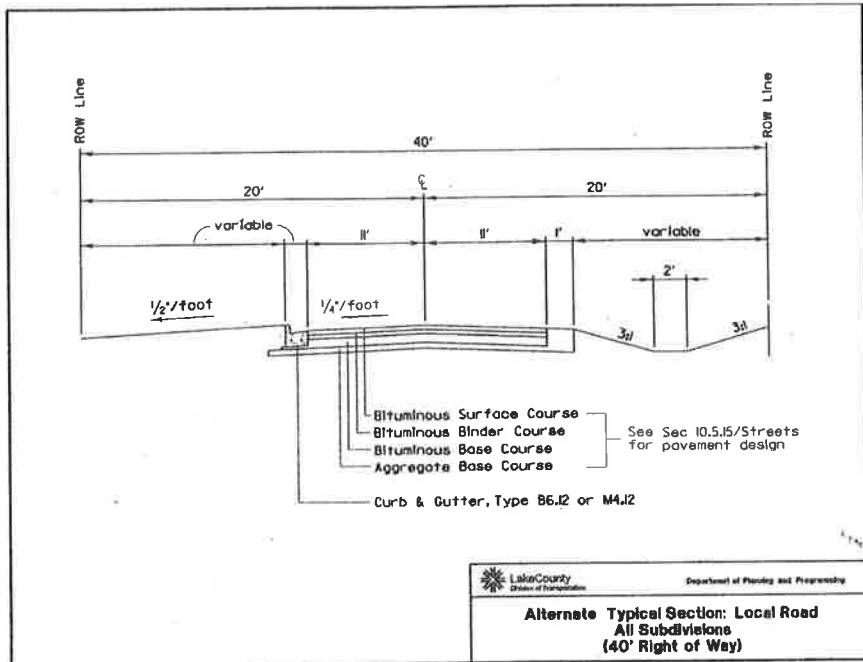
Alternate Typical Section: (40 foot right-of-way)
